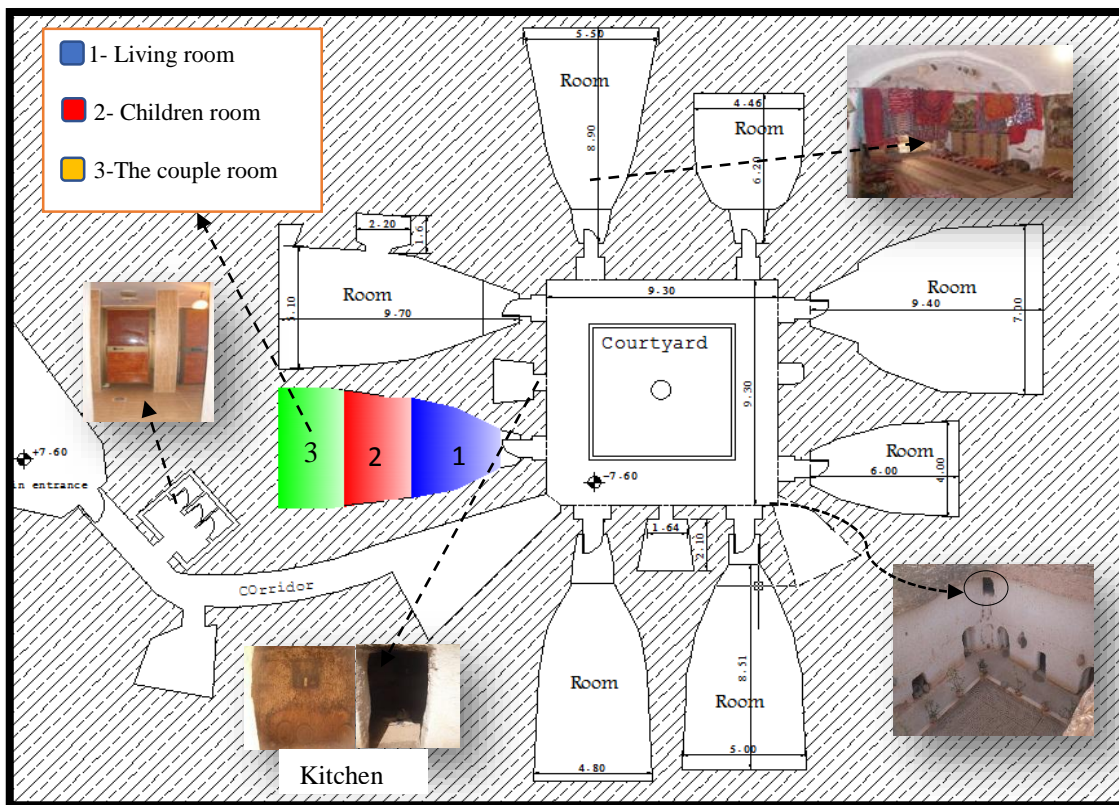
The underground house have 8 bedrooms into the four sides of the courtyard and 3 kitchens (drawing by author)
